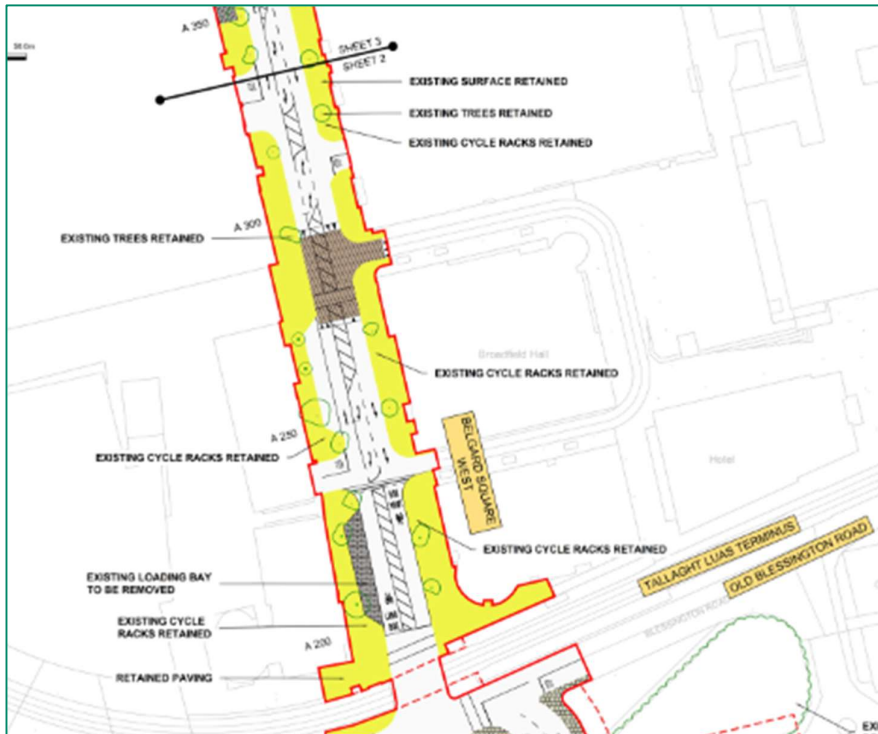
Extract of Landscape General Arrangement Drawings Belgard Square West (north of Old Blessington Road)
